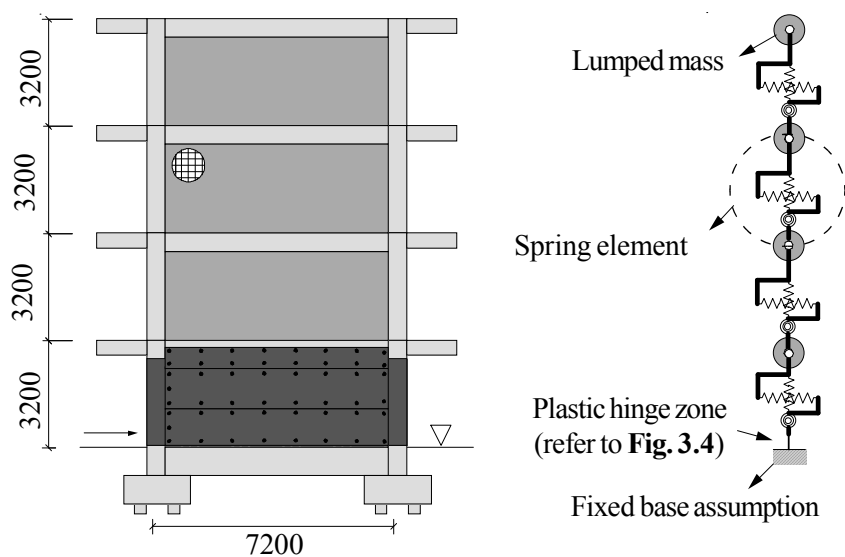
Elevation and model of frame retrofitted by thick hybrid wing-wall (unit: mm)
